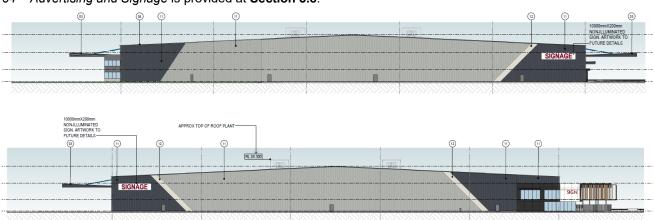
Proposed Tenant Signage Location on the Northern and Southern Elevation
